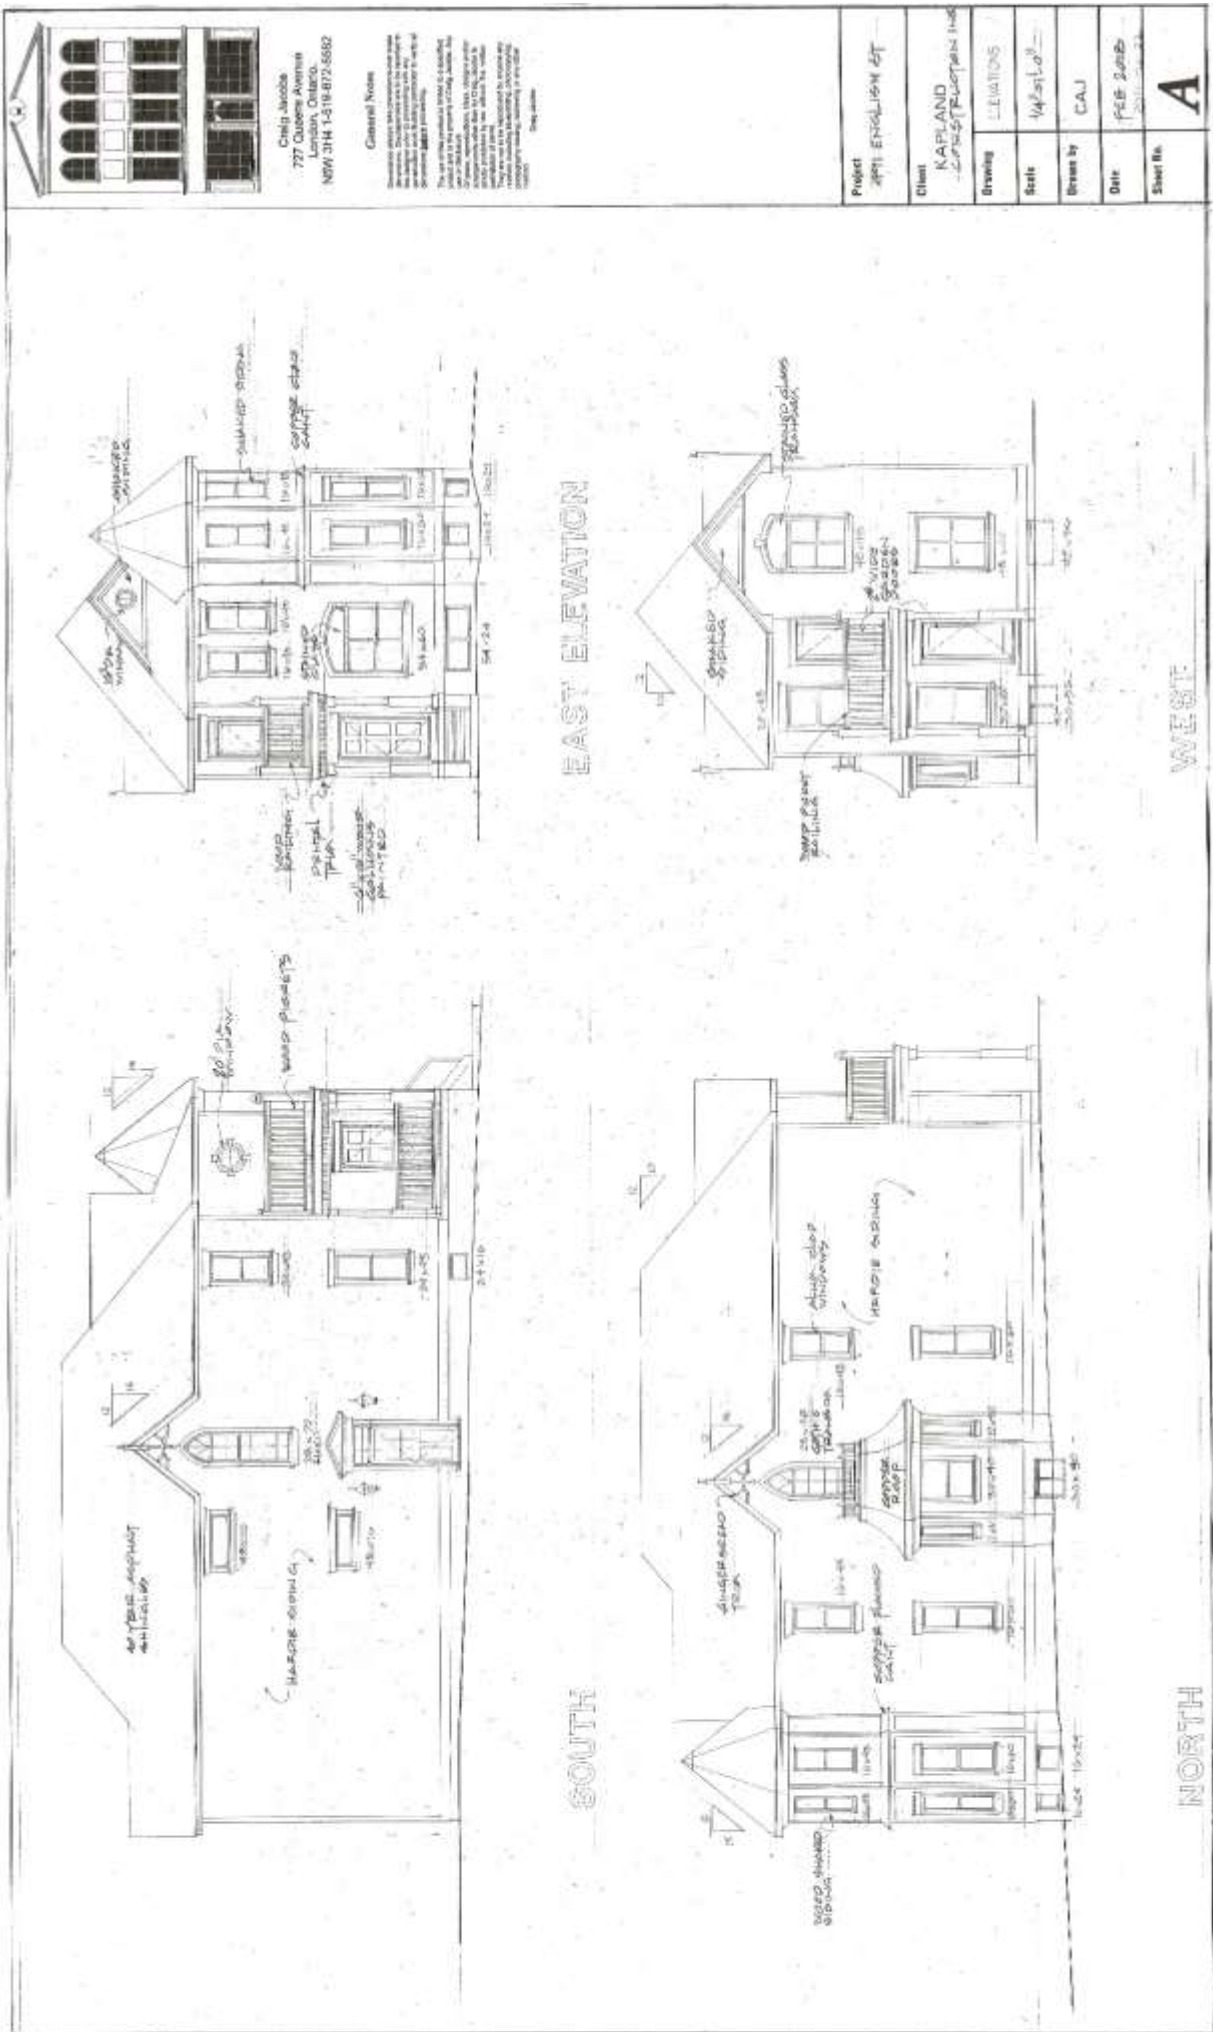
Architectural drawings showing the façades of the proposed building at 491 English Street.
